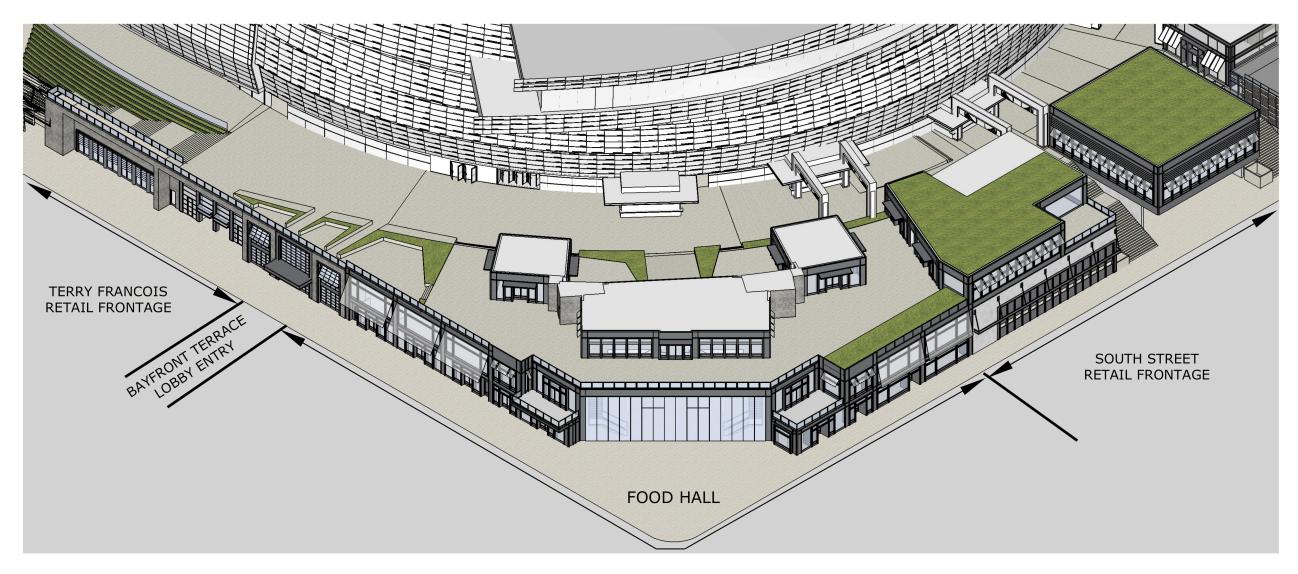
| ISOMETRIC OVERVIEW OF NORTHEAST RETAIL
